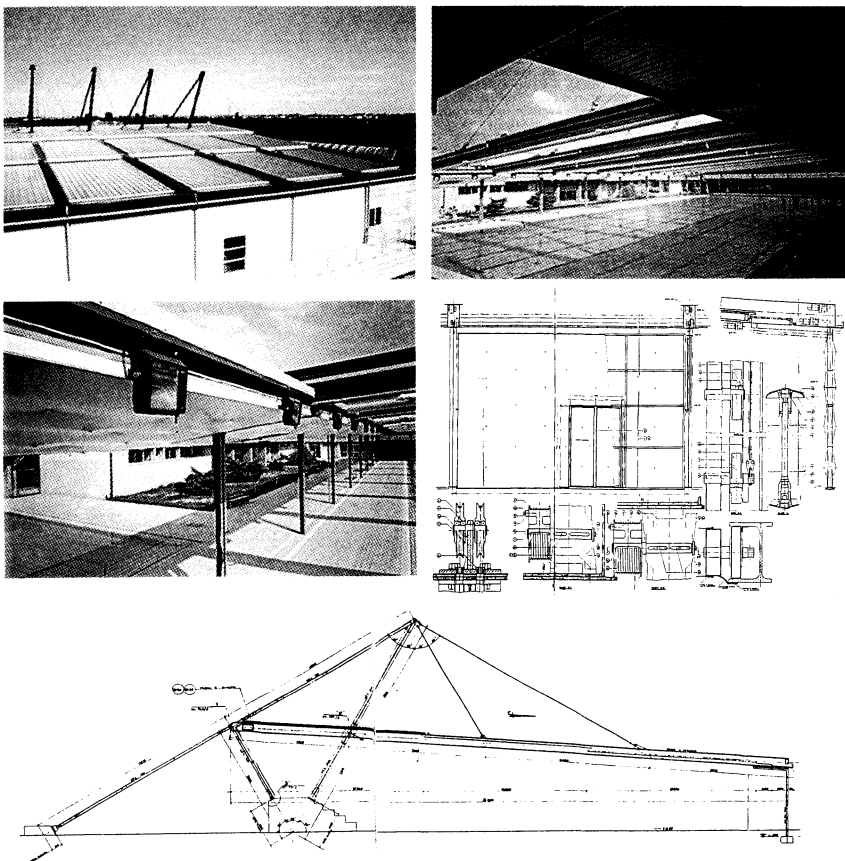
External view of panel covering and movable wall; open situation of covering; open situation for wall-screen; section of the structure; mechanism of the openable wall.
